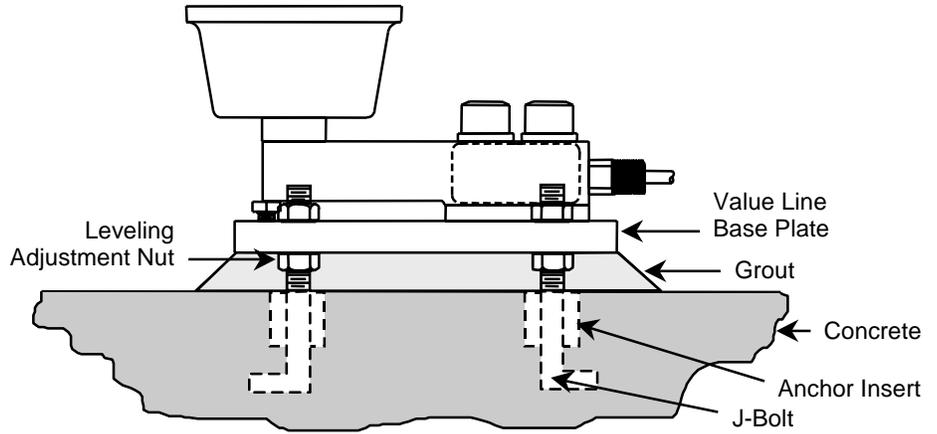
Base Plate Bolted to Unevel Concrete Floor
